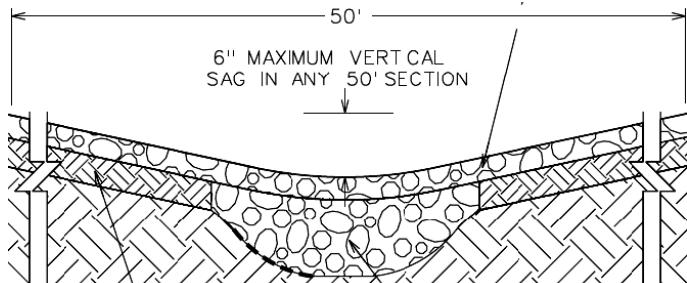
Typical Road Profile Crossing Existing Swale Area
